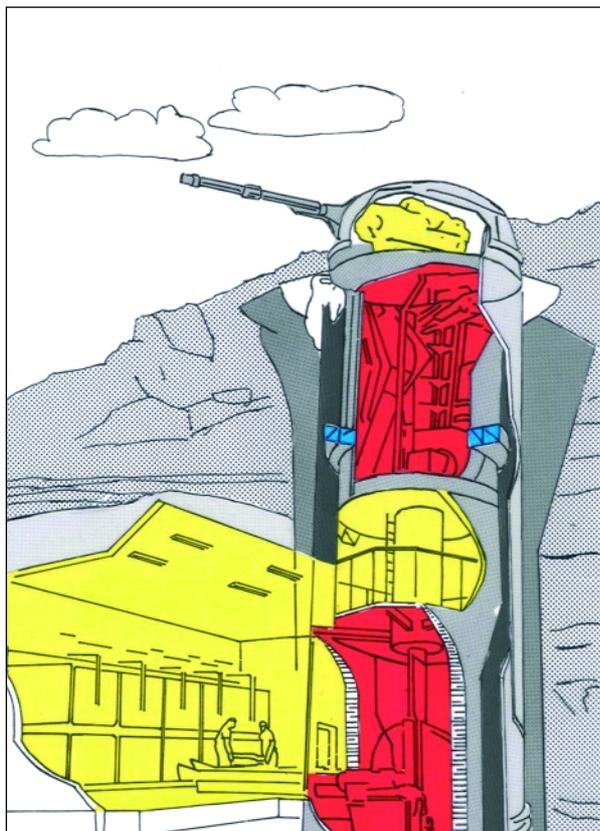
Artistic drawing of 120mm coast artillery gun placed underground and a "pop-up" radar station
